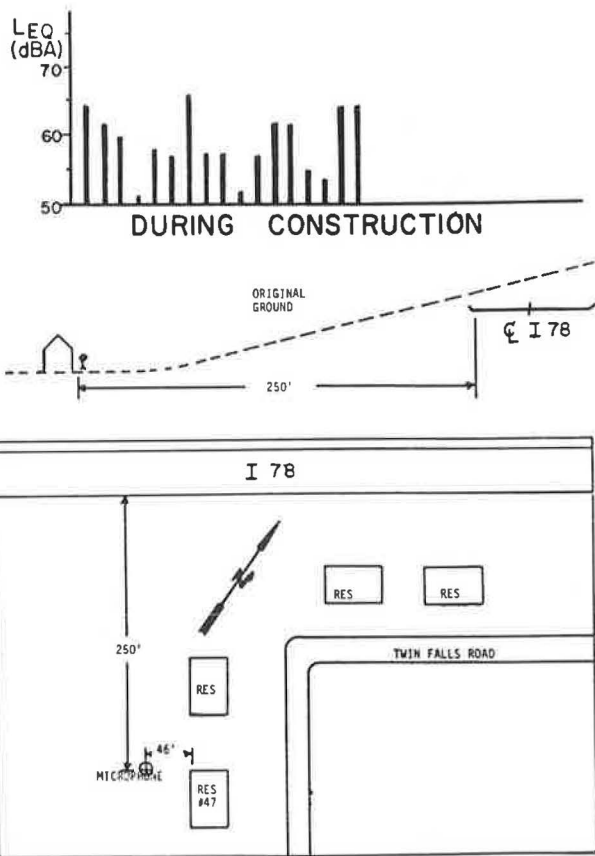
Site 9: Cowap home, 47 Twin Falls Road.
